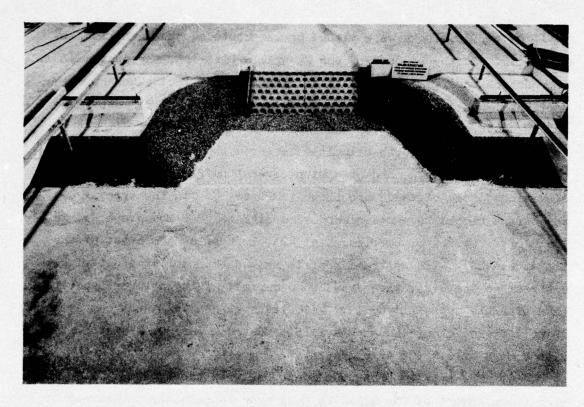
Type 15 (recommended) structure showing stilling pool abutments
